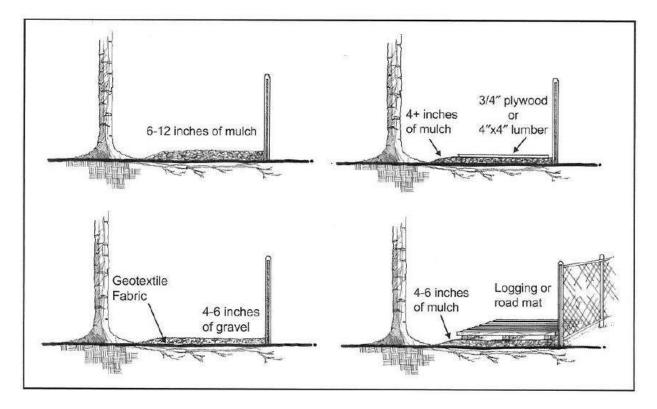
Horizontal root protection options (from Fite and Smiley, 2008)
